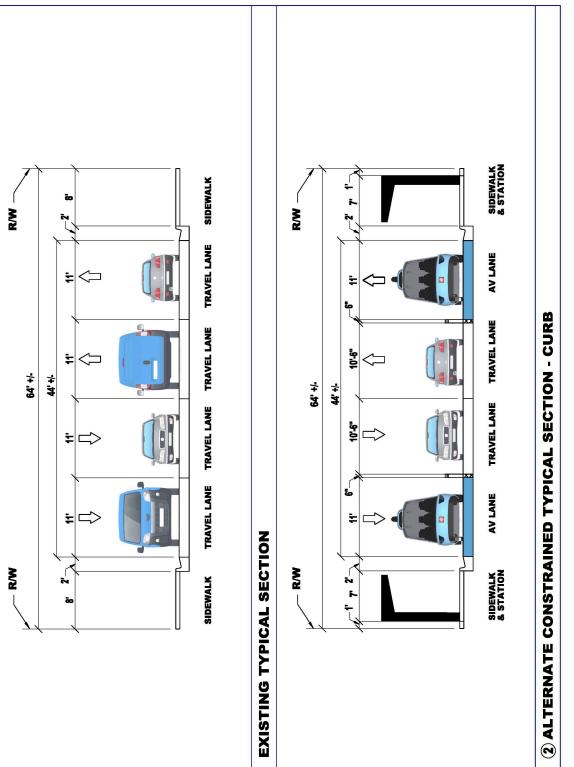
South Corridor Existing and Alternate Constrained Typical Sections with Curbside Stations - San Marco Blvd north of Nira Street
